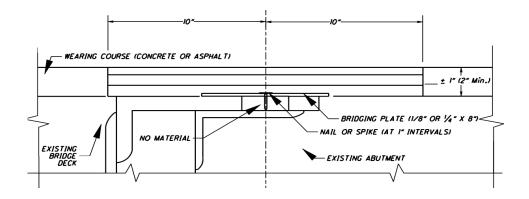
ODOT asphaltic plug joint detail (steel beam bridge)
